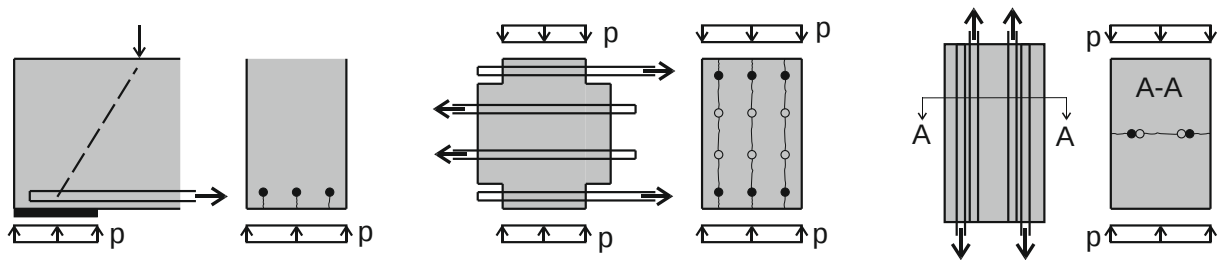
Test specimens with transverse pressure: beam-end type specimen (left), test conducted by BATAYNEH [BAT93] (centre) and tests conducted by CAIRNS AND JONES [CAI96] (right)
